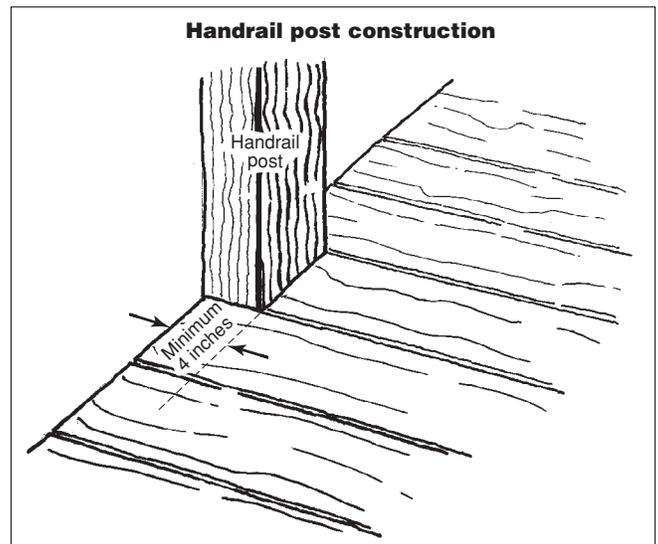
When the handrail post is attached to the stringer below the deck, the decking should extend at least 4 inches beyond the stringer.
